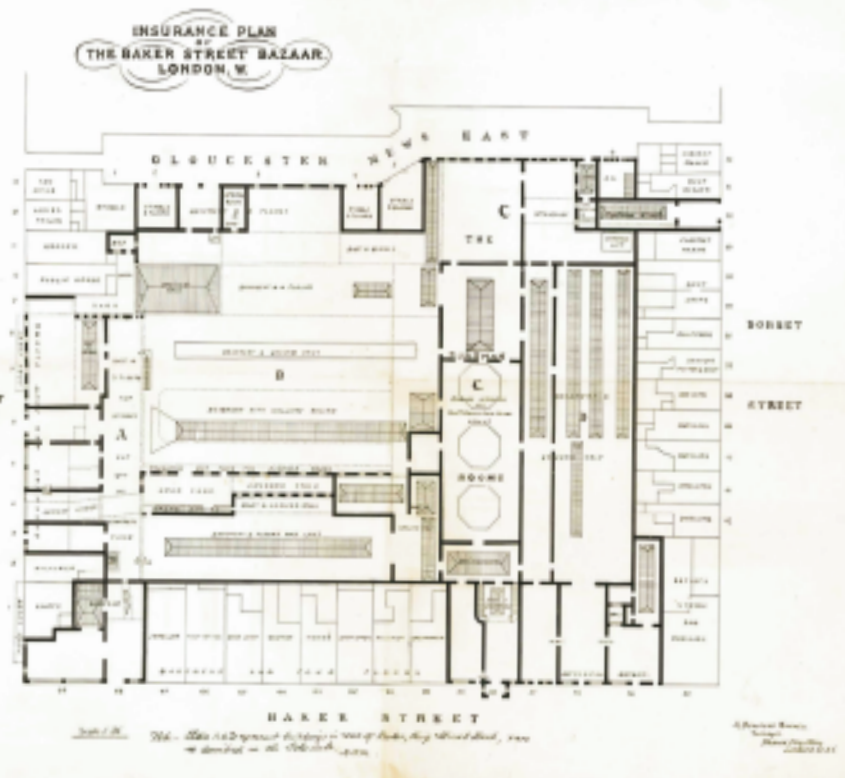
Plan of the Baker Street Bazaar c1919. The Great Room (see Fig 3) had been vacated by Madame Tussaud's and, at this date, it had become part of the 'Portman Rooms' (marked 'C' on the plan).
